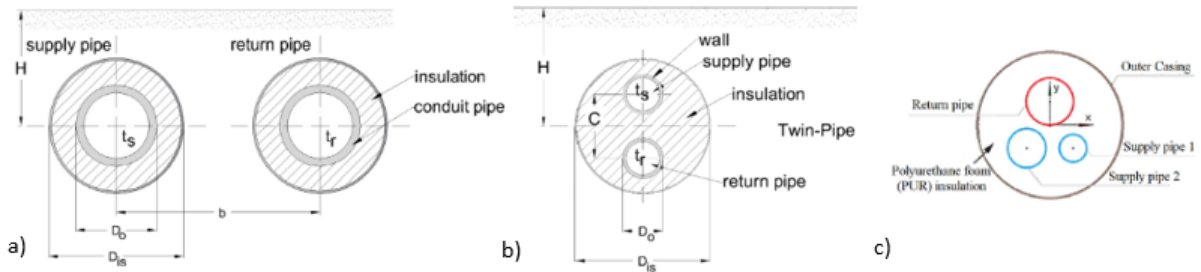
Piping cross-section: a) Pre-insulated pipes b) Twin pipes c) Triple pipes (adapted from [54, 55]).
